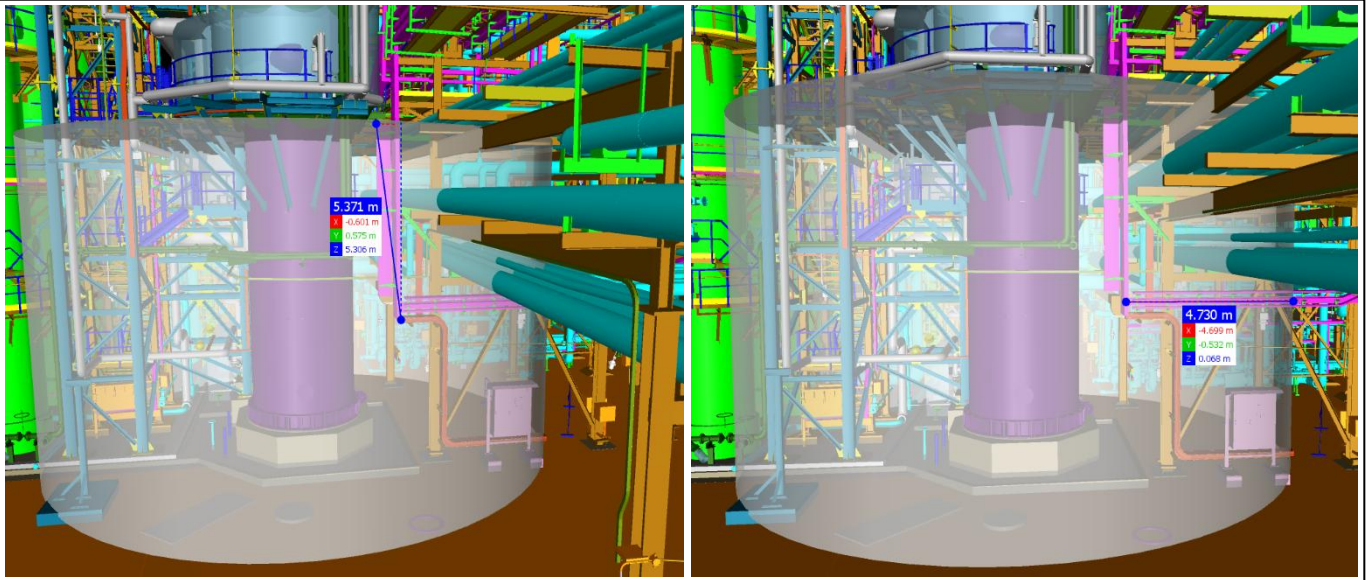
Model viewpoint with extent of Fireproofing to Existing Cables/Cable Tray in FSE.
